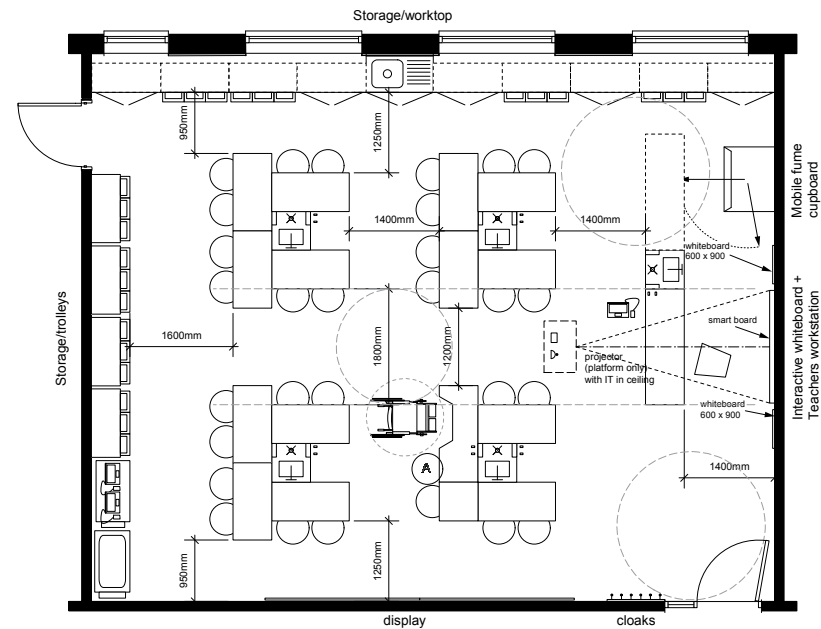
floor plan of accessible mainstream science laboratory for up to 30 students of around 90 m² having access for one wheelchair user to access all facilities such as perimeter bench, demonstration bench and whiteboard. (Source: *Building Bulletin 102, DCSF*)
